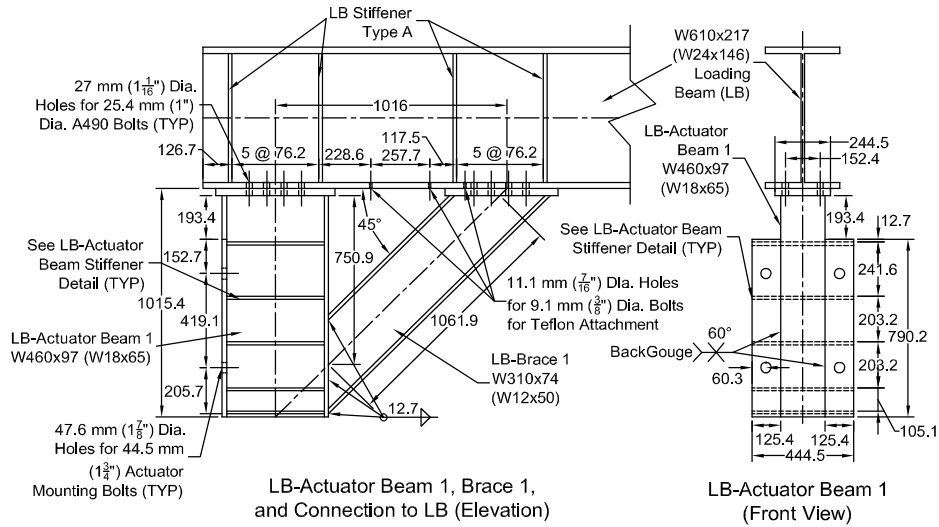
LB Actuator Beam and Brace and Connection to Loading Beam
